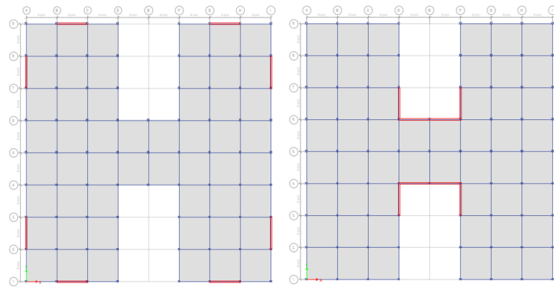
Shear wall at Location 1 Fig-2 Shear wall at location 2
